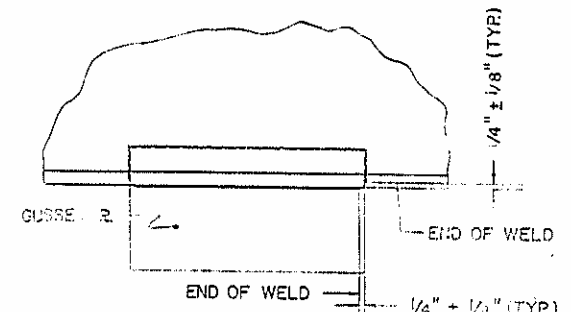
DETAIL OF END BENT & INTERIOR BENT DIAPHRAGM CONNECTION
